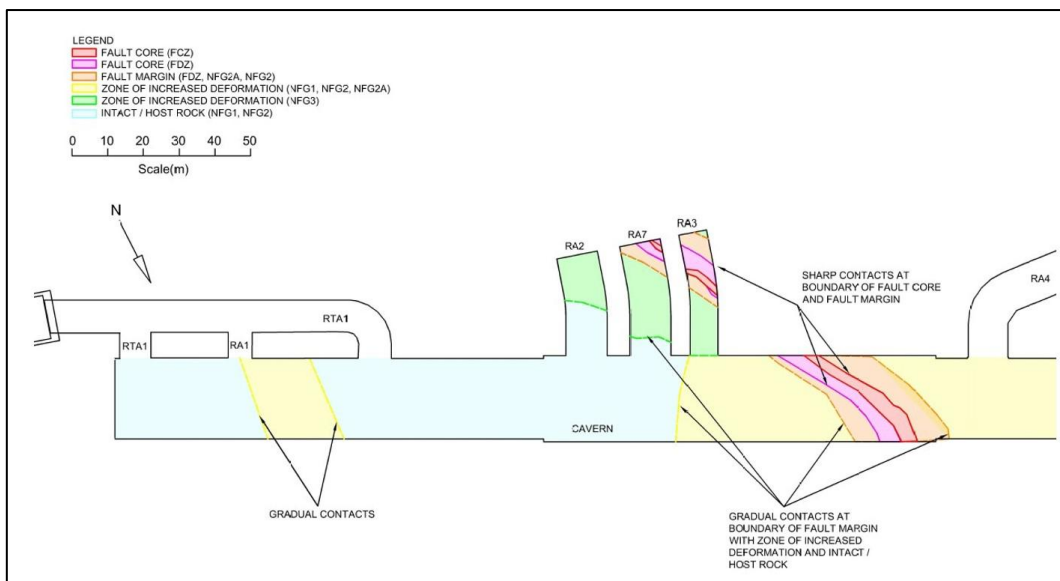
Roma Street Station rock mass units encountered in the cavern and adit crown during construction (Cammack et. al. 2023).
